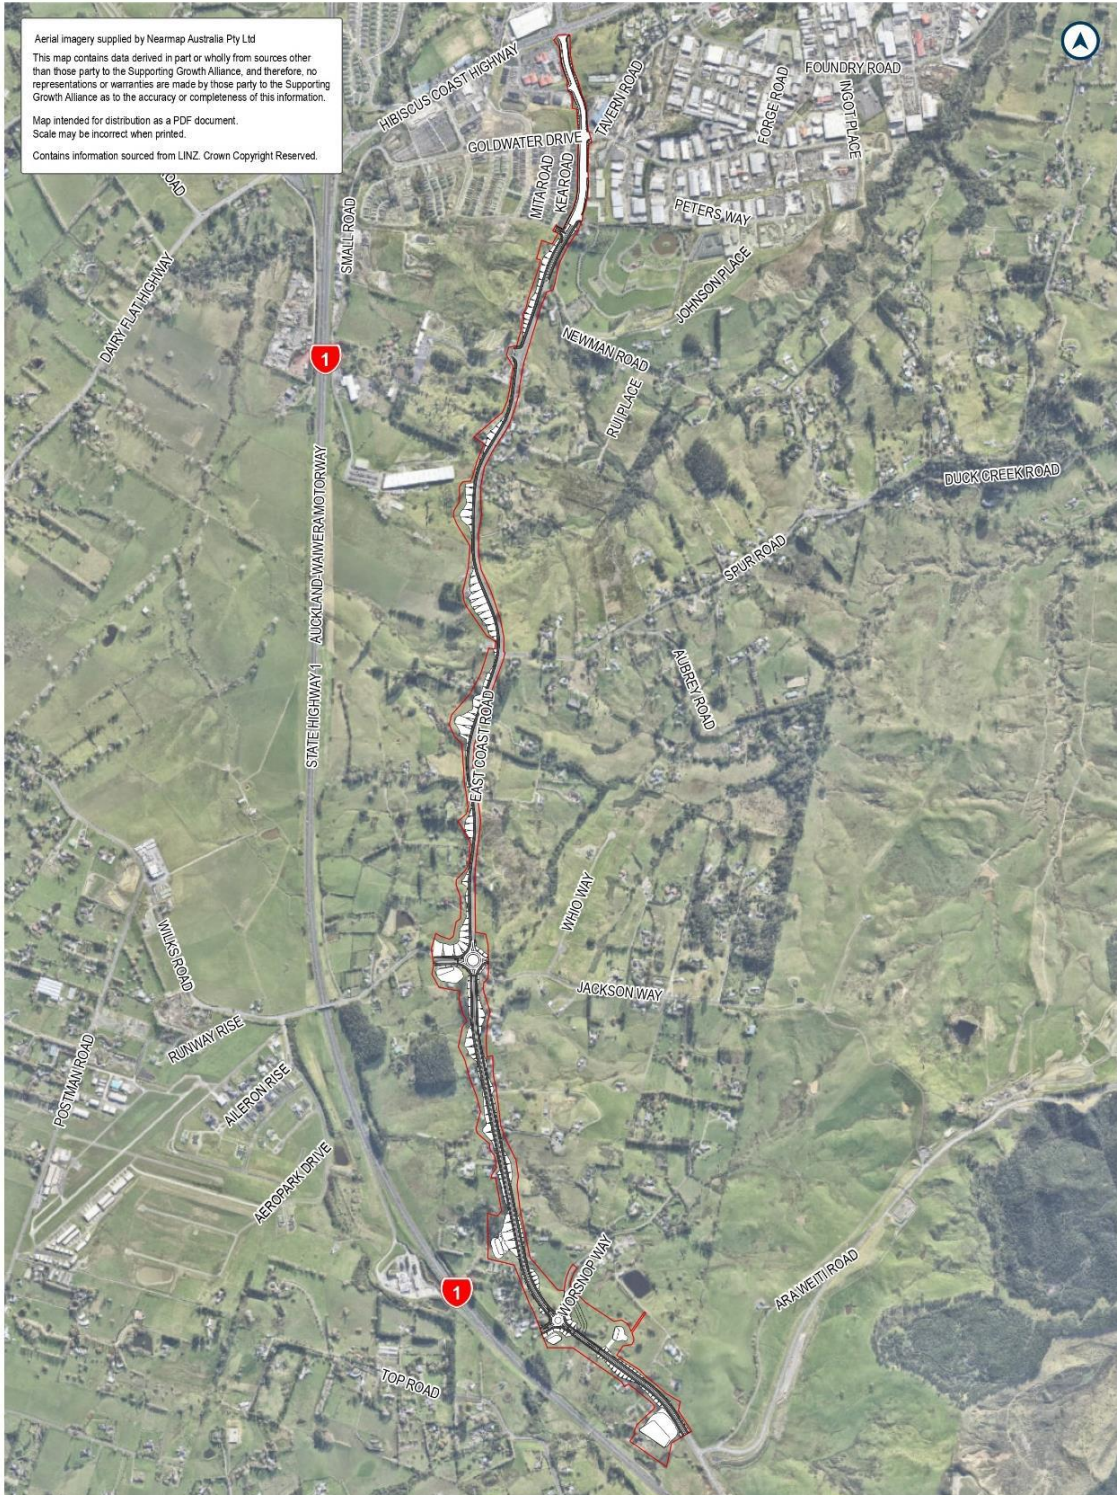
NoR 12 location and extent (sourced from the General Arrangement Plan)
